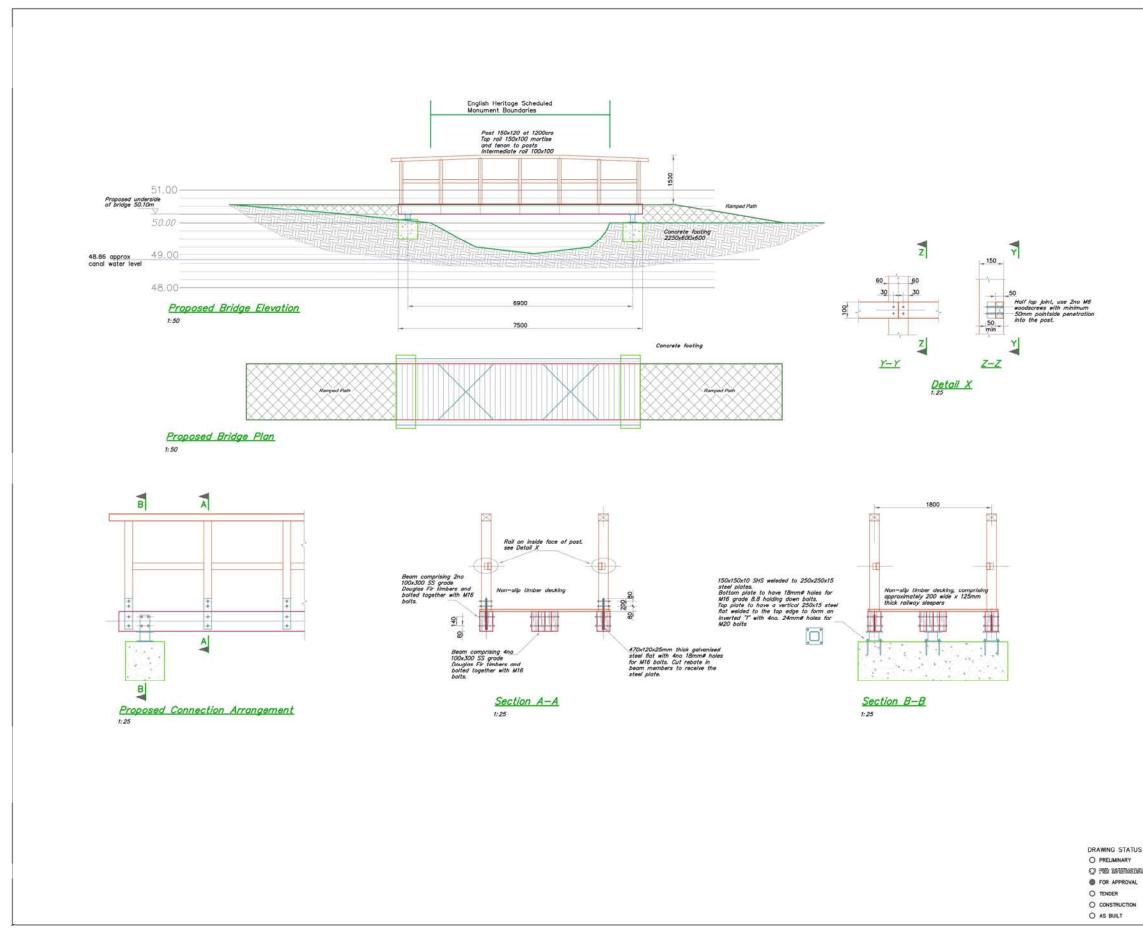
Detailed plan, section drawing and specifications of the proposed new footbridge crossing the Tavistock Canal (Knevitts)
